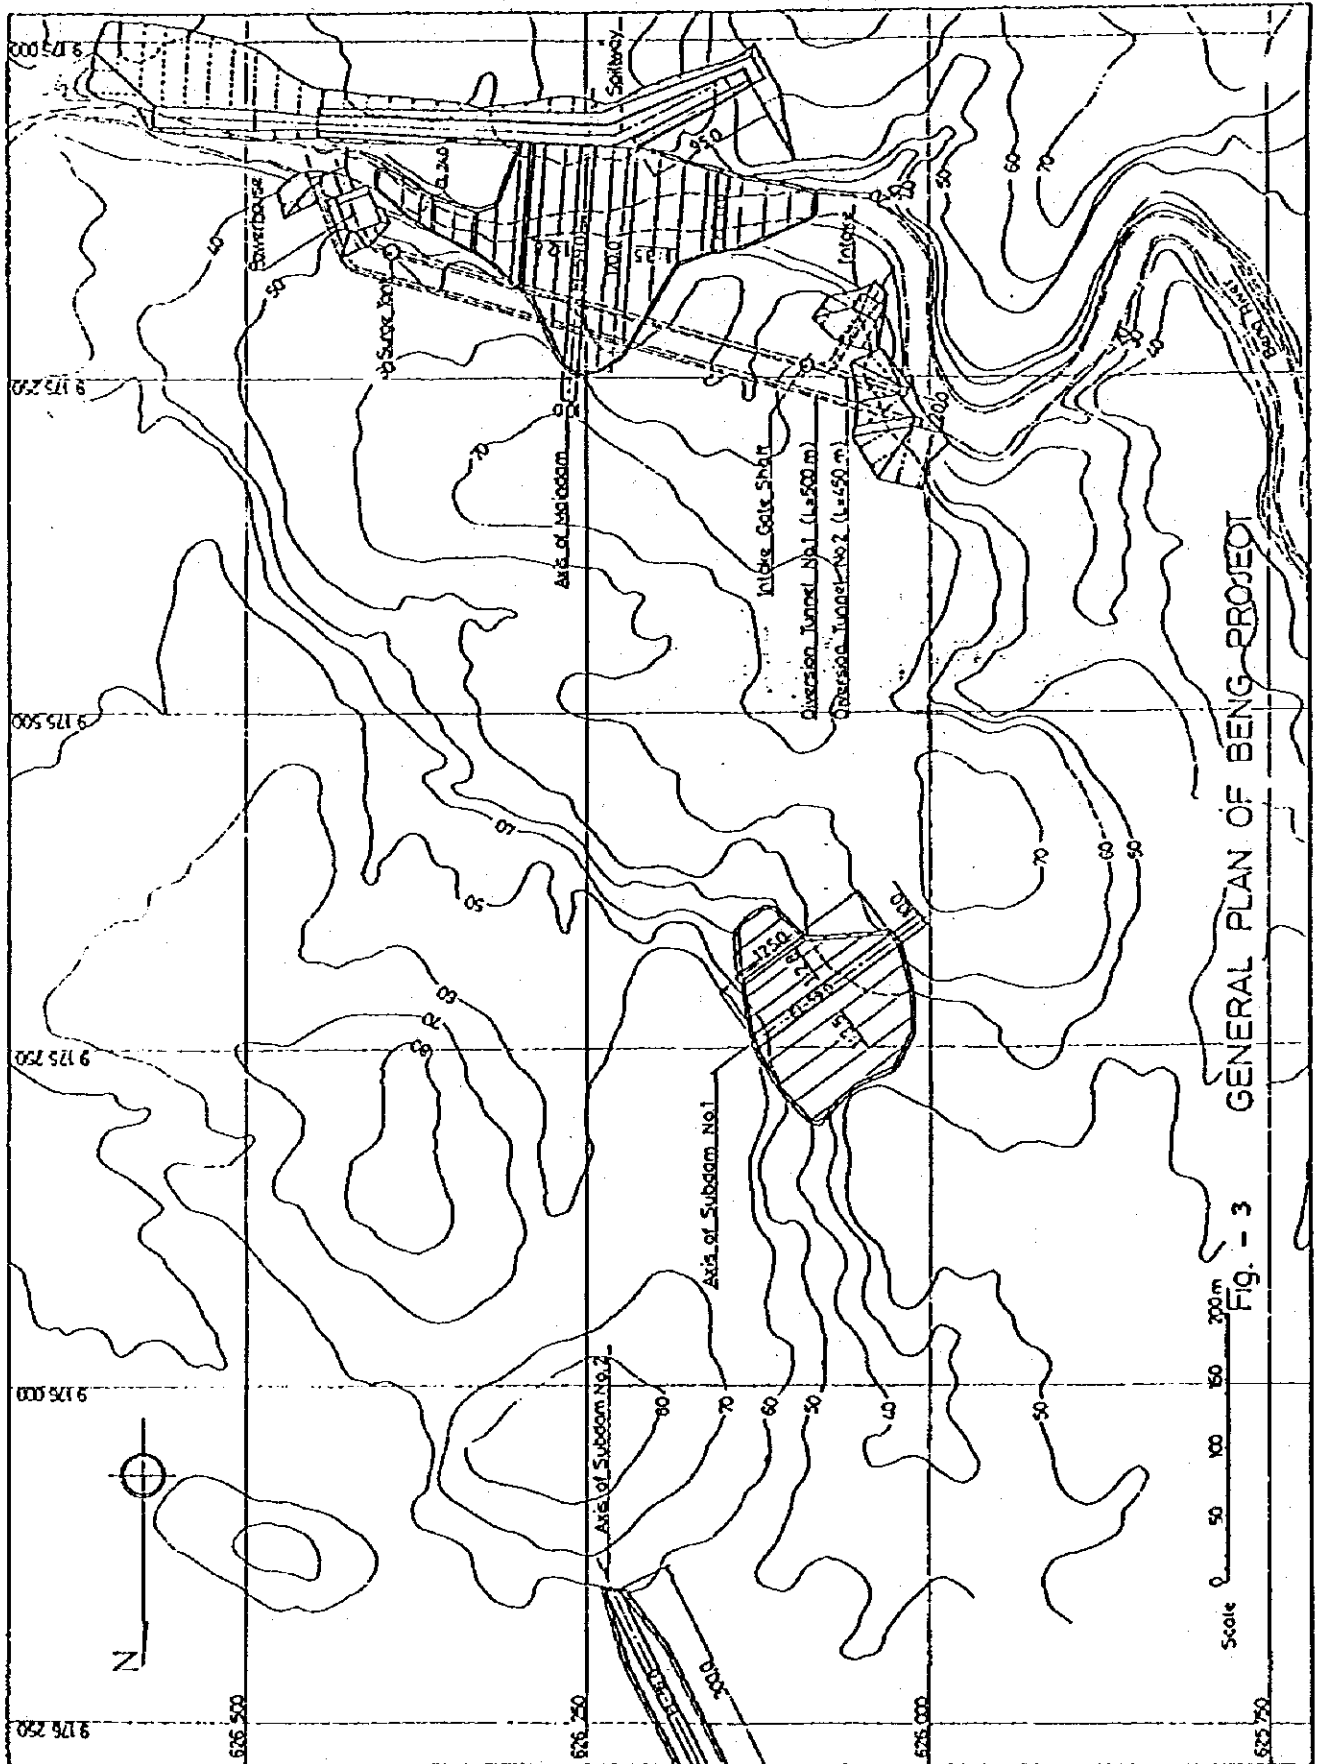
GENERAL PLAN OF BENG PROJECT
